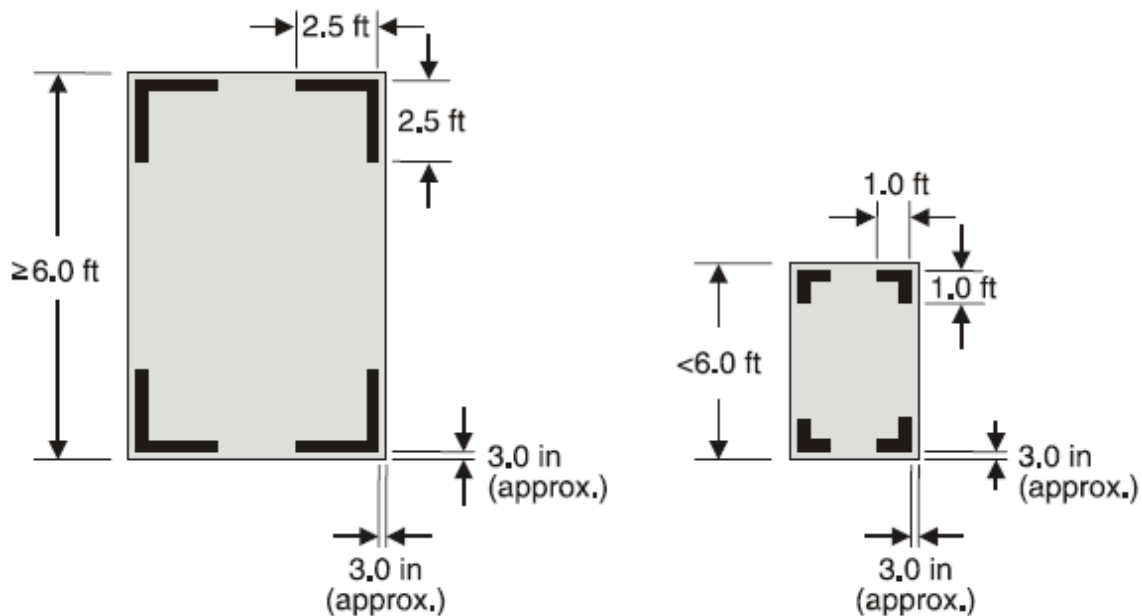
Recommended Steel Plate Marking. *Left:* Steel plates greater than or equal to 6 feet in length; *right:* steel plates less than 6 feet in length.
